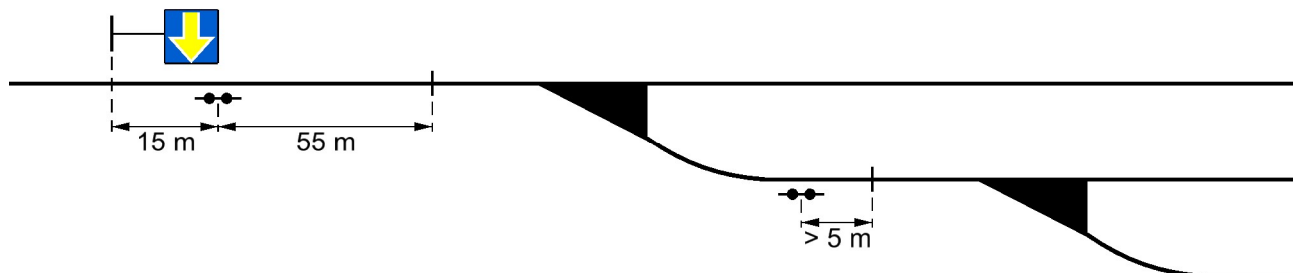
AXLE COUNTER FROM SWITCH BLADE TOE / TYPICAL LAYOUT
